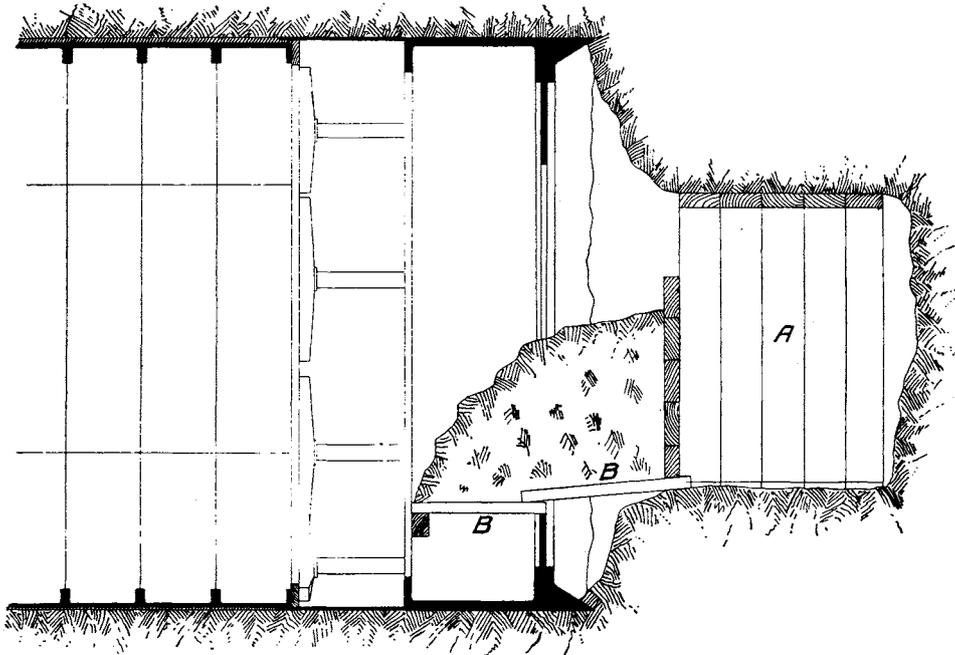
THE GREATHEAD SHIELD IN CLAY.
